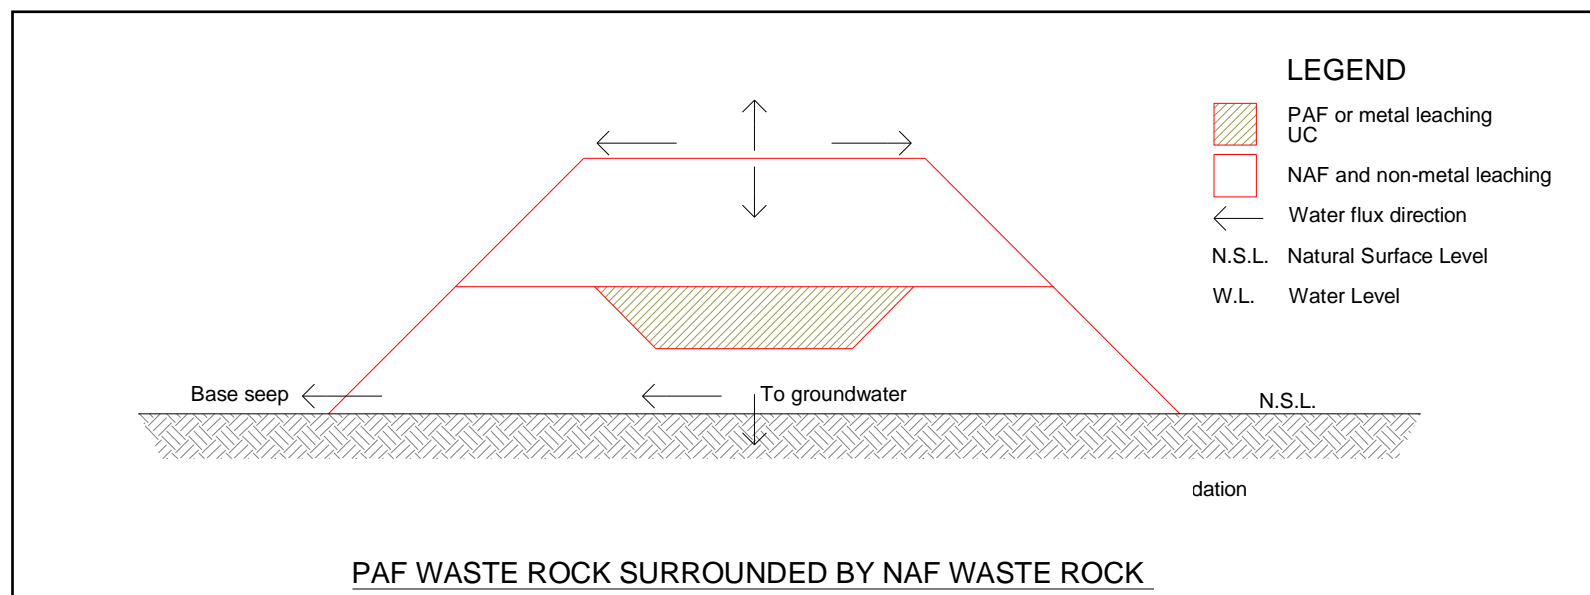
PAF waste rock surrounded by NAF waste rock
